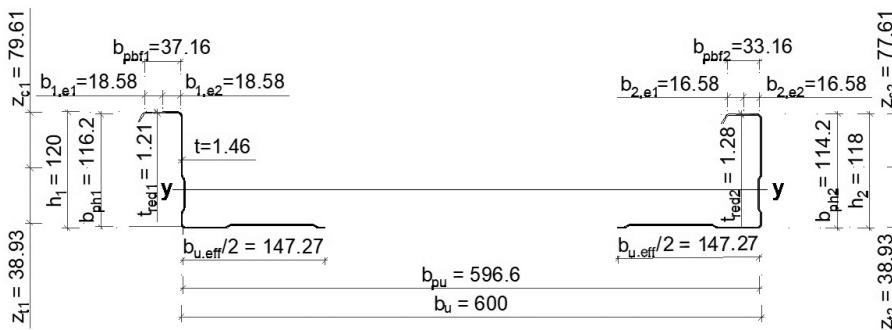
Effective cross section of the narrow flange under compression and the entire cross sections of the webs of a 600/120 wall cassette
